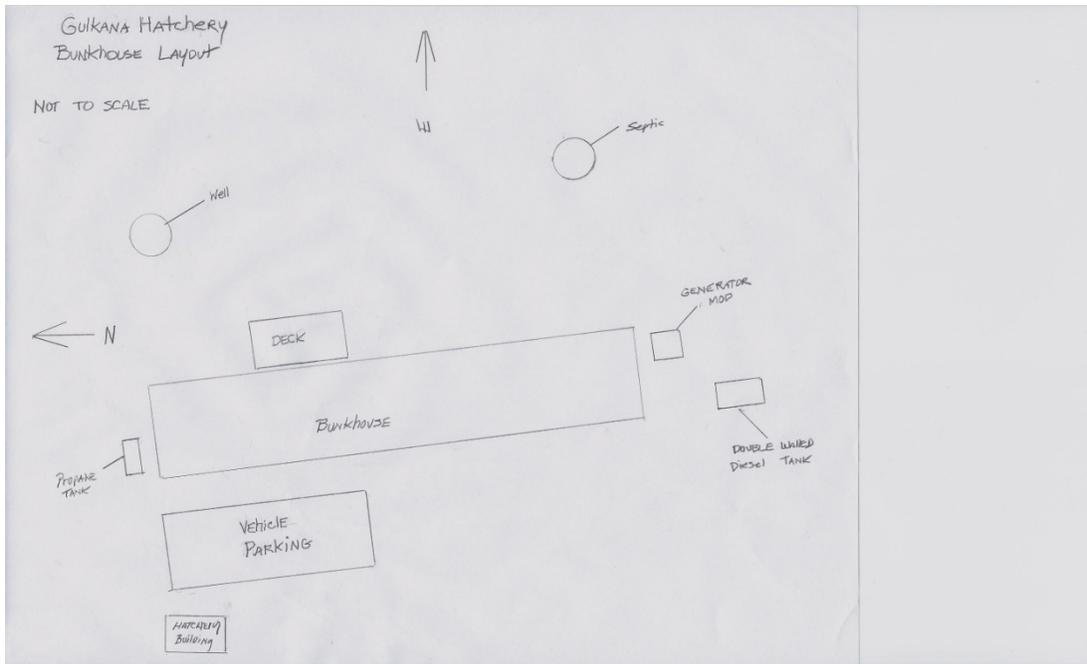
Conceptual layout of proposed new bunkhouse facilities.
